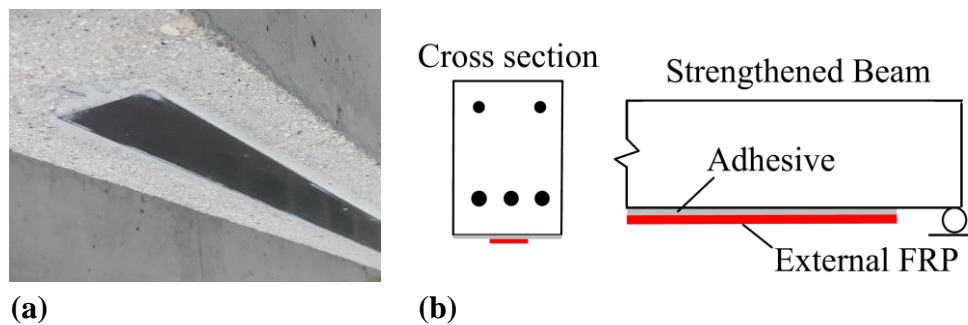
EBR strengthening system: (a) typical application for flexural strengthening of an RC beam and (b) laminates positioning scheme in the beam's sections [25]
